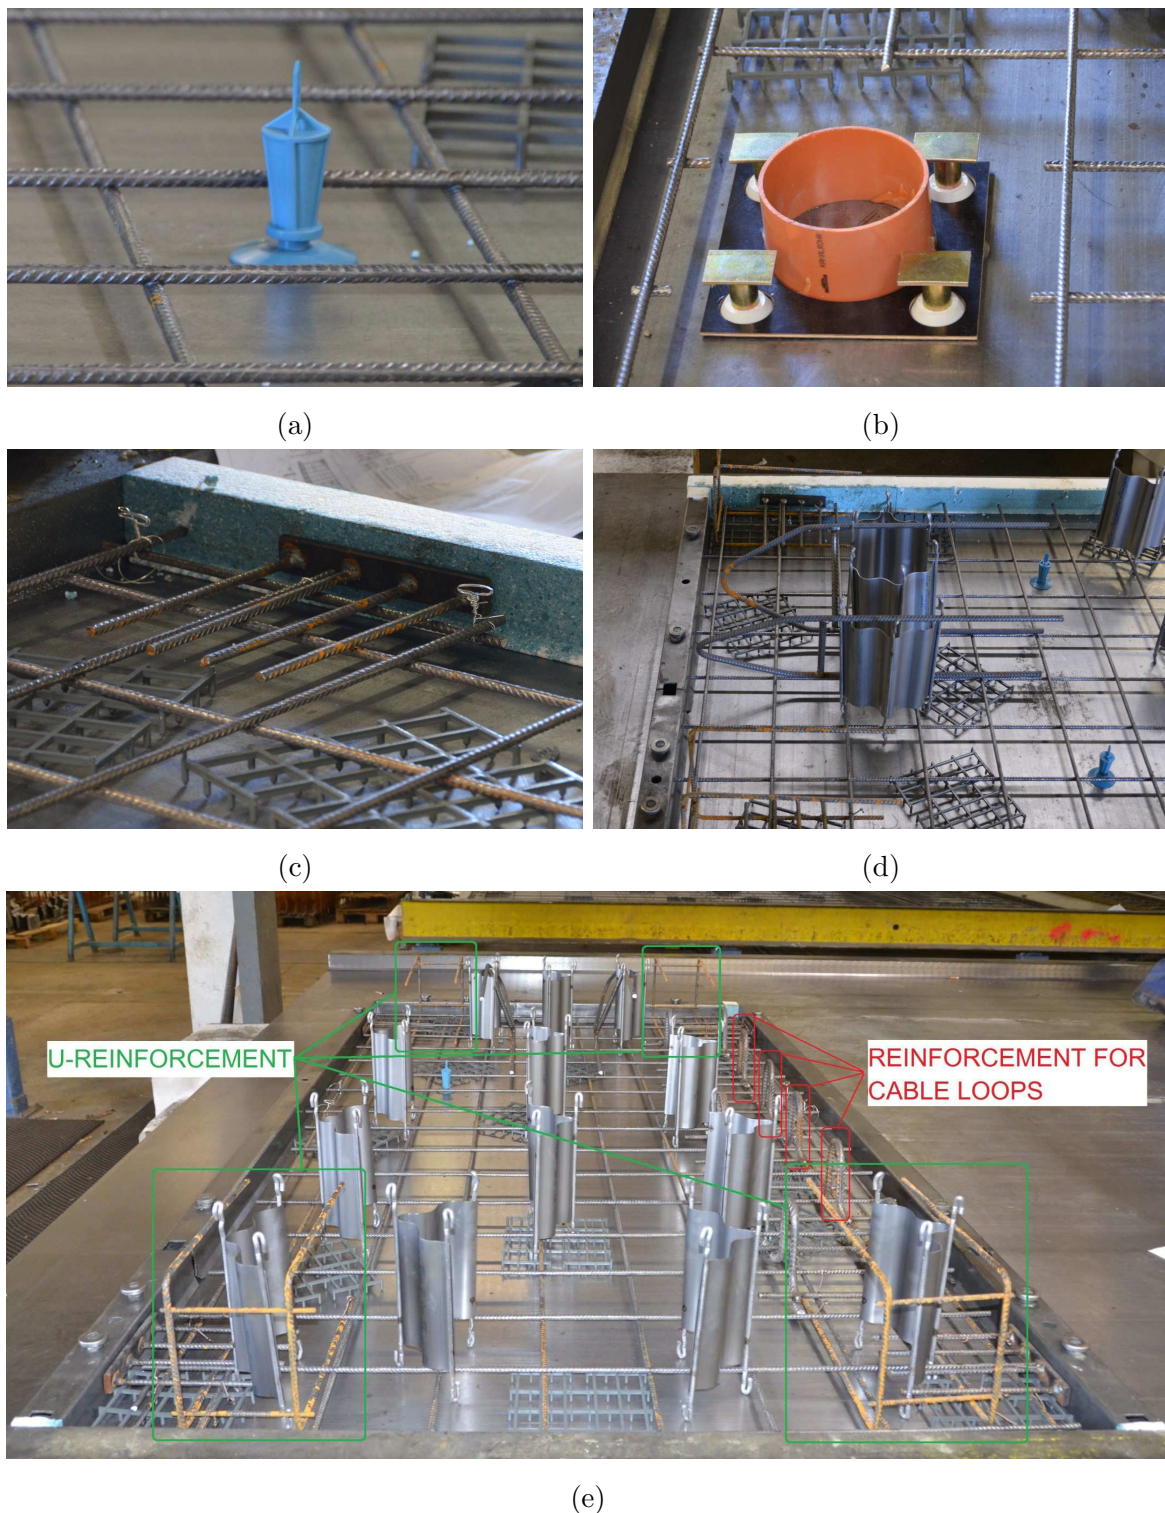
Reinforcement and embedments placed in the outer shell of the elements used for mock-up; (a) plastic anchors that are used to attach screw bracings; (b) opening for concreting; (c) welding embedments for the connection of arranged elements; (d) standard lifting hooks; and (e) finished formwork of the first shell prepared for following stage
